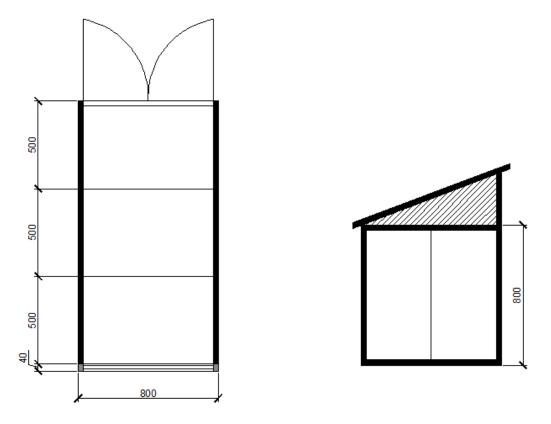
Left: Test bed plan. Right: test bed section. (dimensions in mm).
